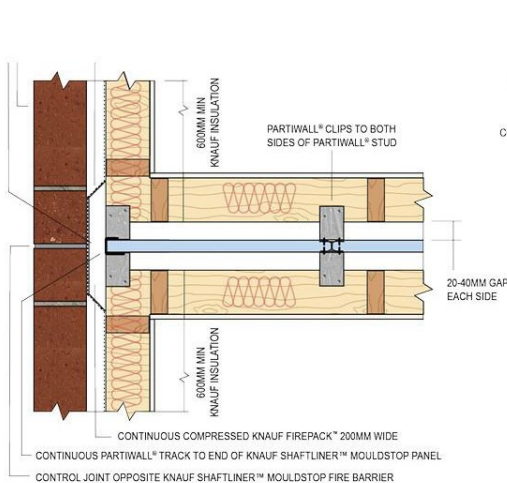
Brick Veneer Wall Junction 2 – Plan view
